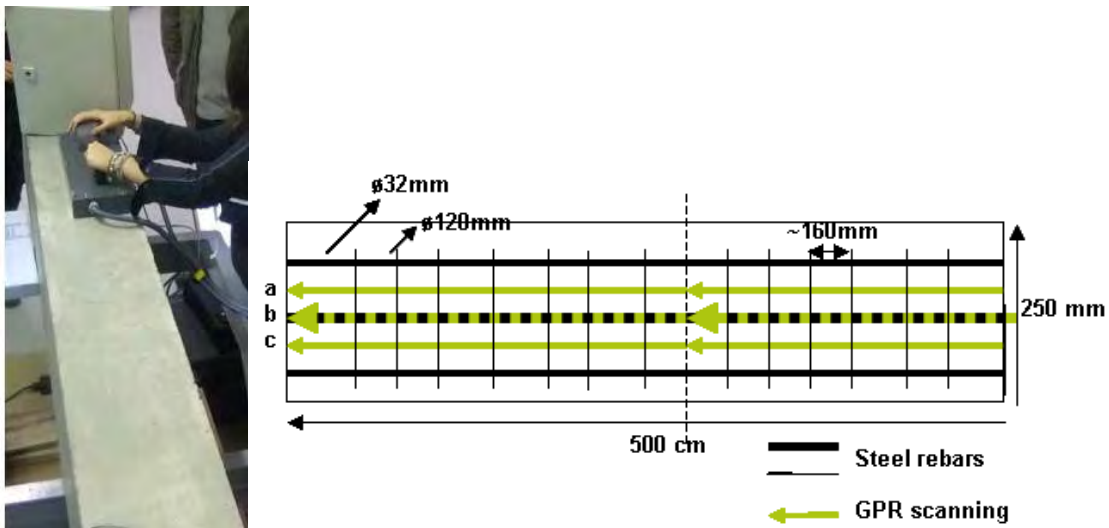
GPR scanning along the reinforced concrete beam. Three scanings were realised on each side. In the case depicted, the left side of the concrete beam is under investigation.
